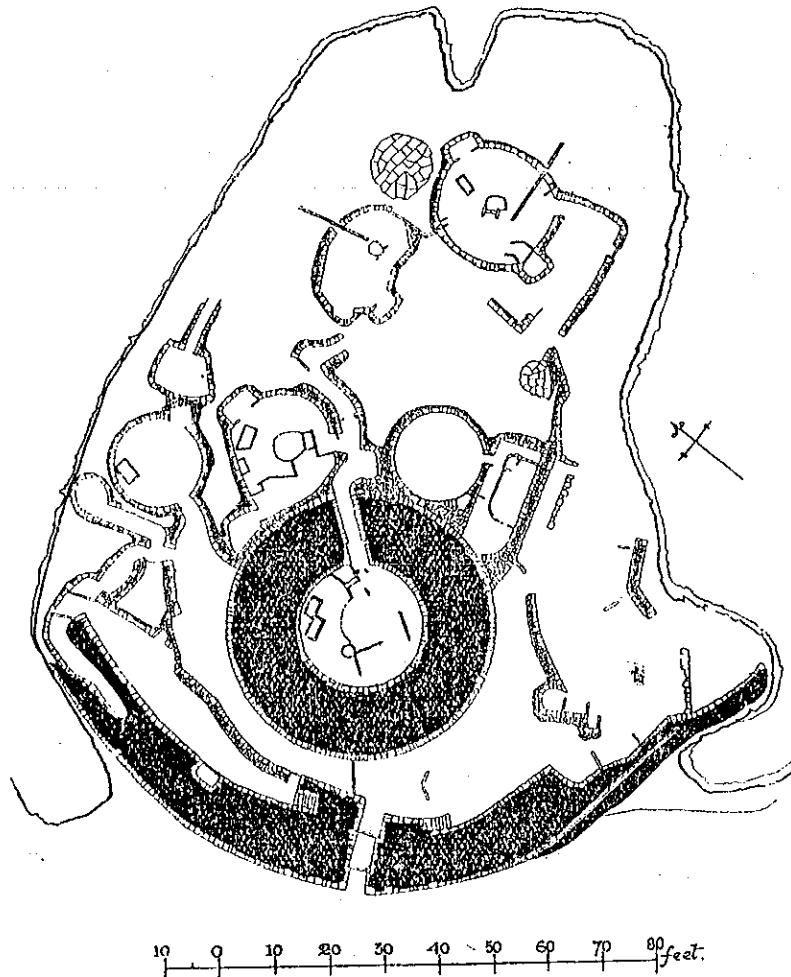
Broch, Nybster (No. 518); Ground-plan.
